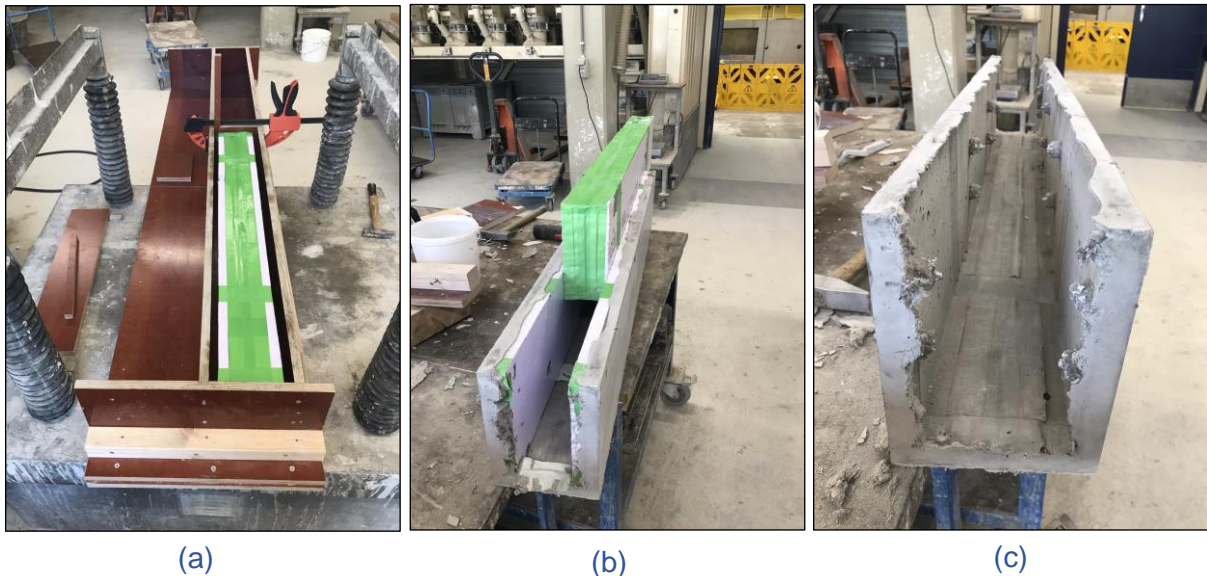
Steps in the casting session: before casting (a), removing the inner mould (b) and final result (c).
